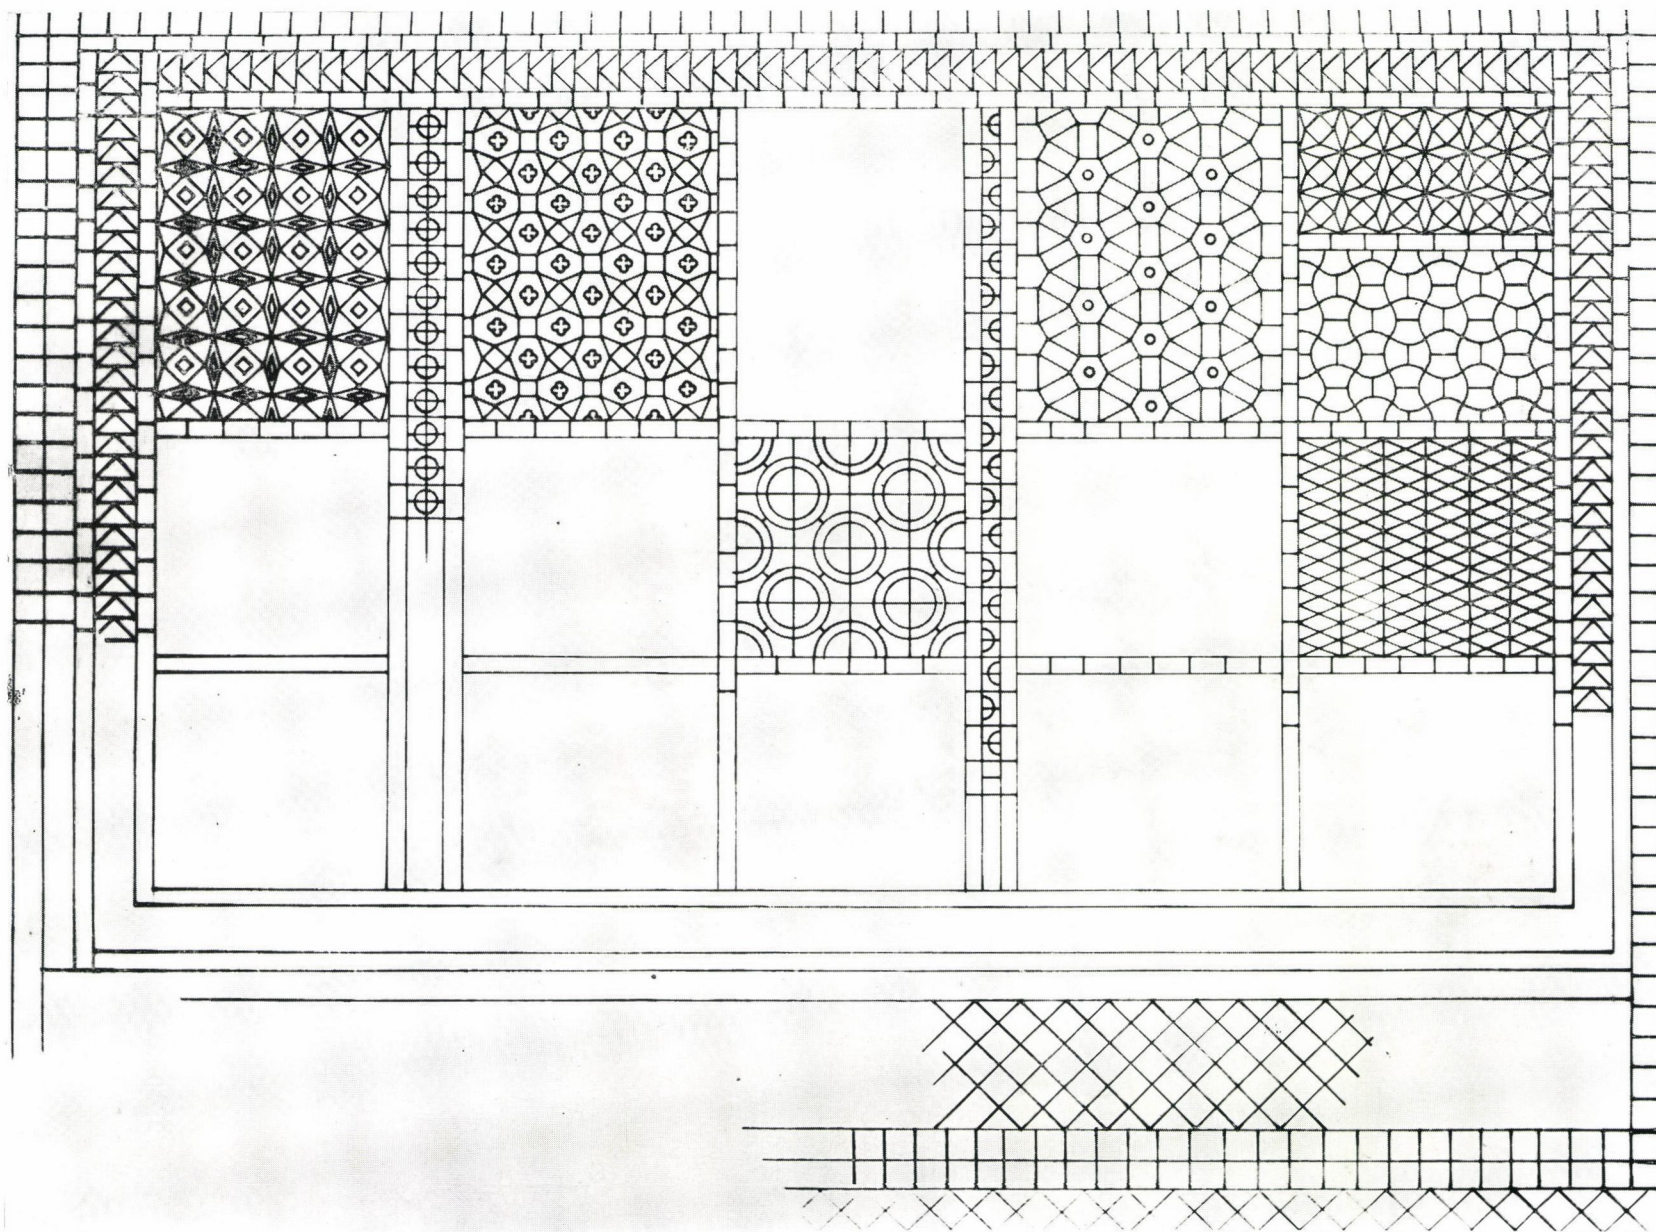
Drawing of the reconstruction of the brick mosaic pavement at Pilis (E. Egyed)
